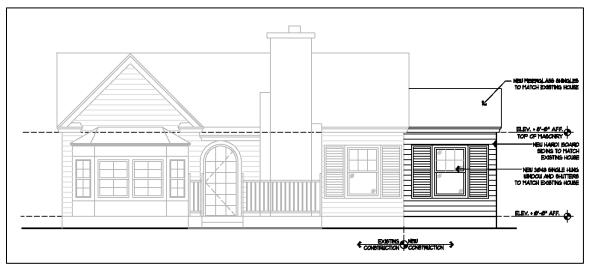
Approved front elevation with new side addition. The plans state that the roofing material will be shingles to match existing house.
